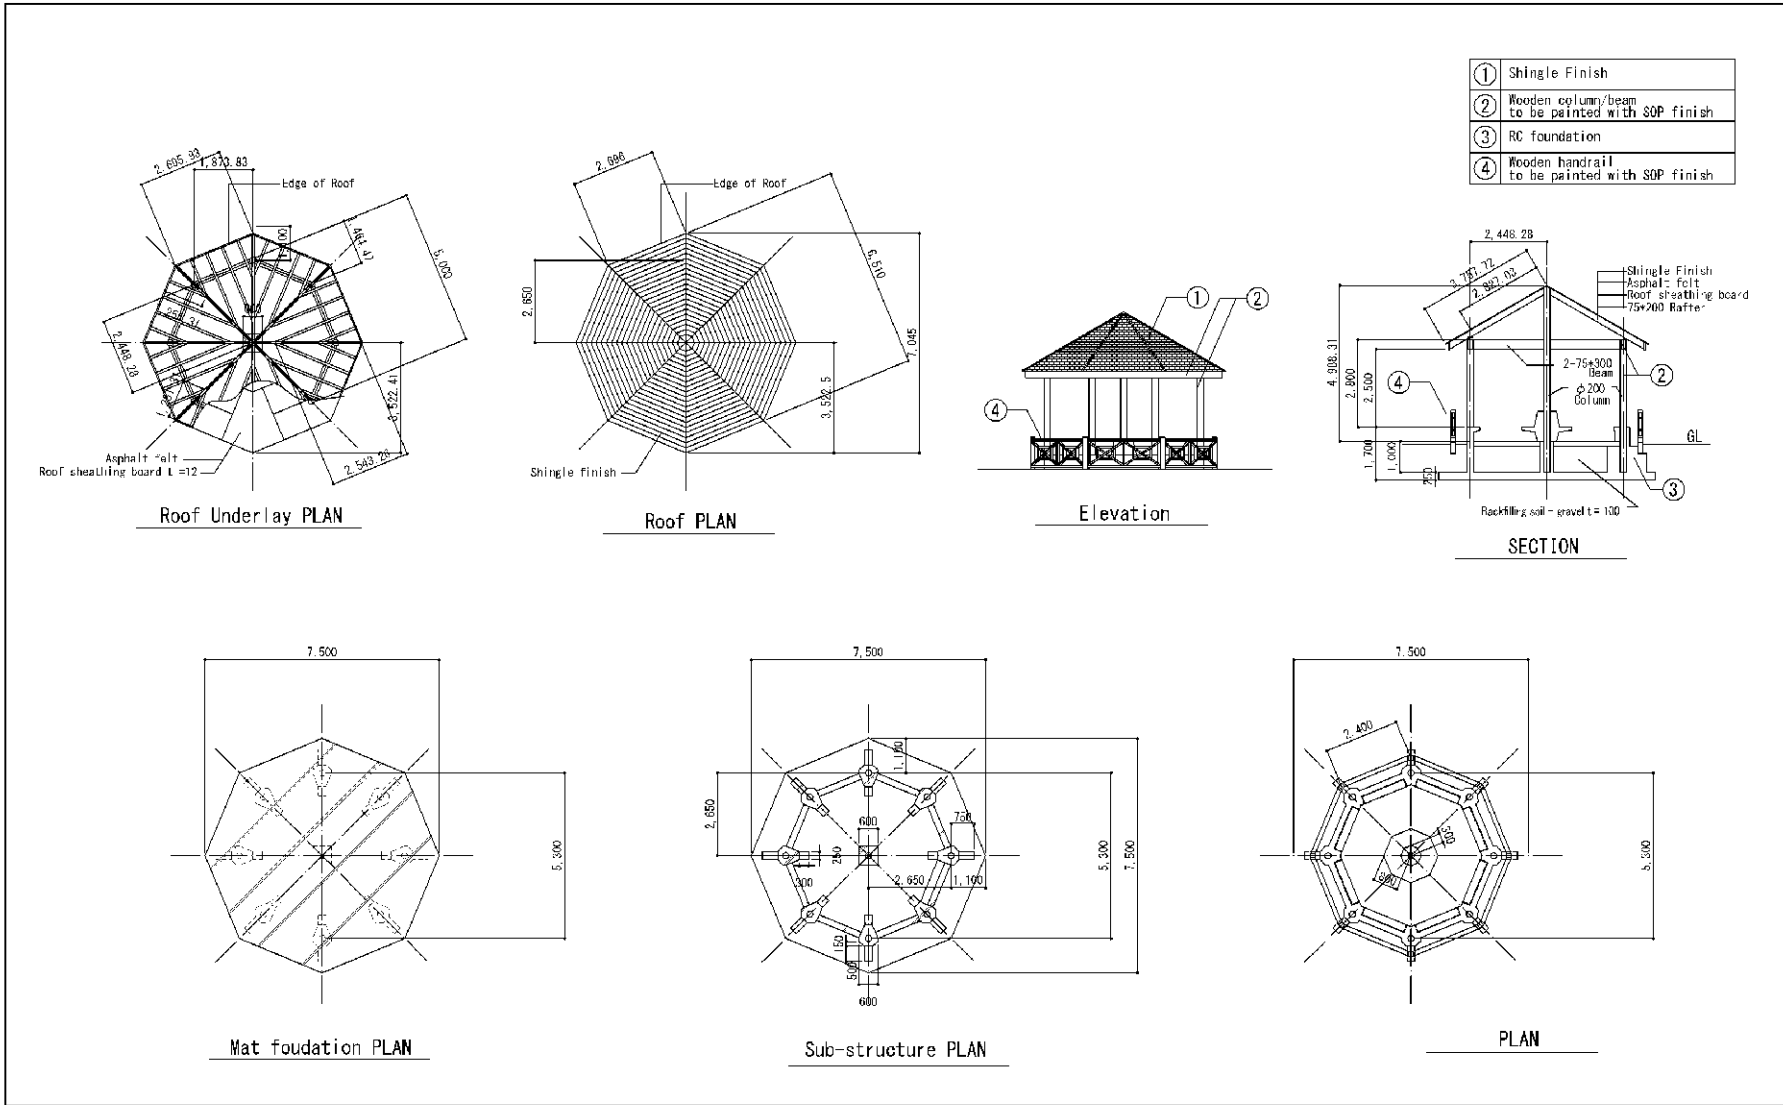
(13) Gazebo (Plan, View and Cross Section)
